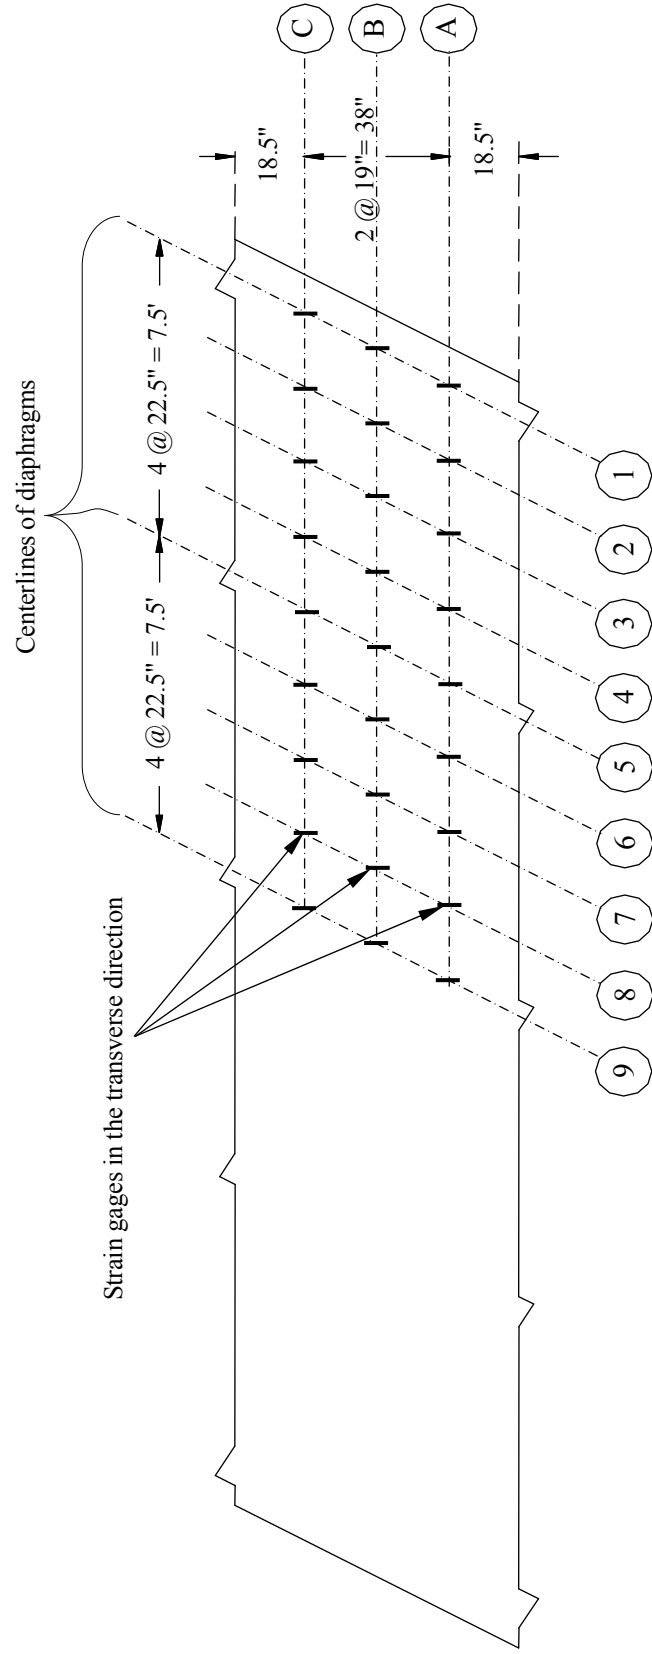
Layout of the strain gages installed on the deck slab.
